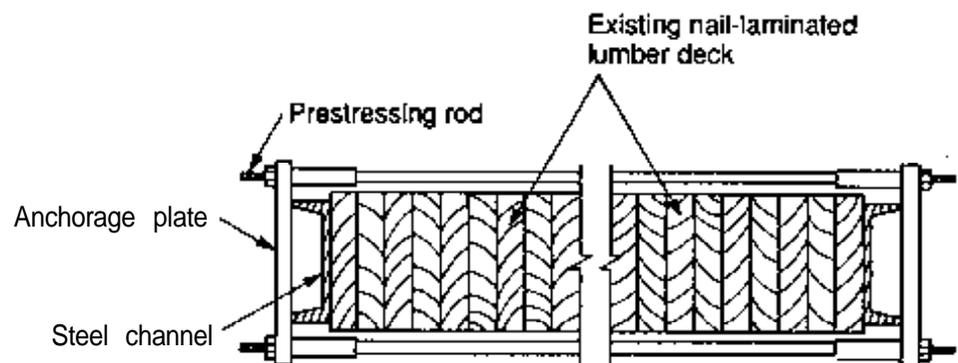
Typical rod and anchorage configuration for stressing existing nail-laminated lumber decks.
